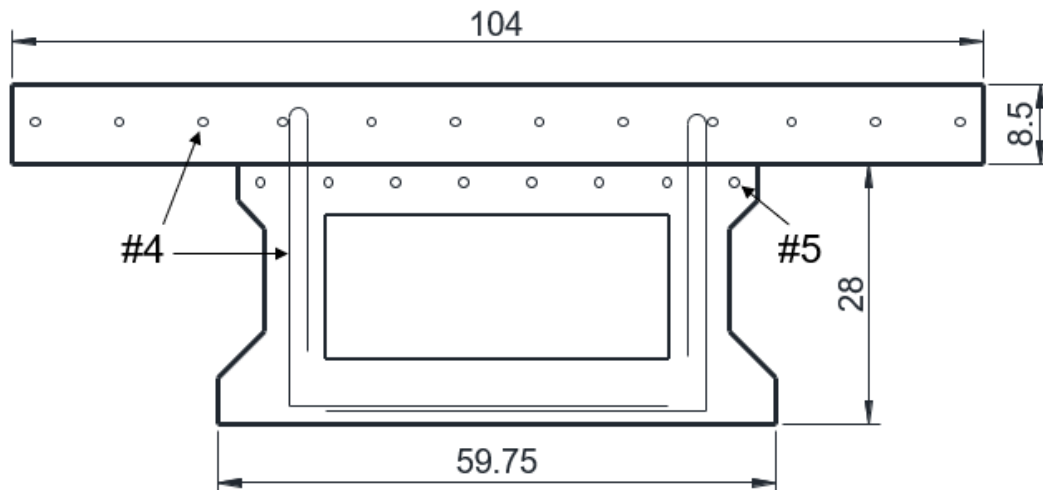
The cross-section geometry and reinforcement detail for 5XB28 and 8.5-in. height deck
